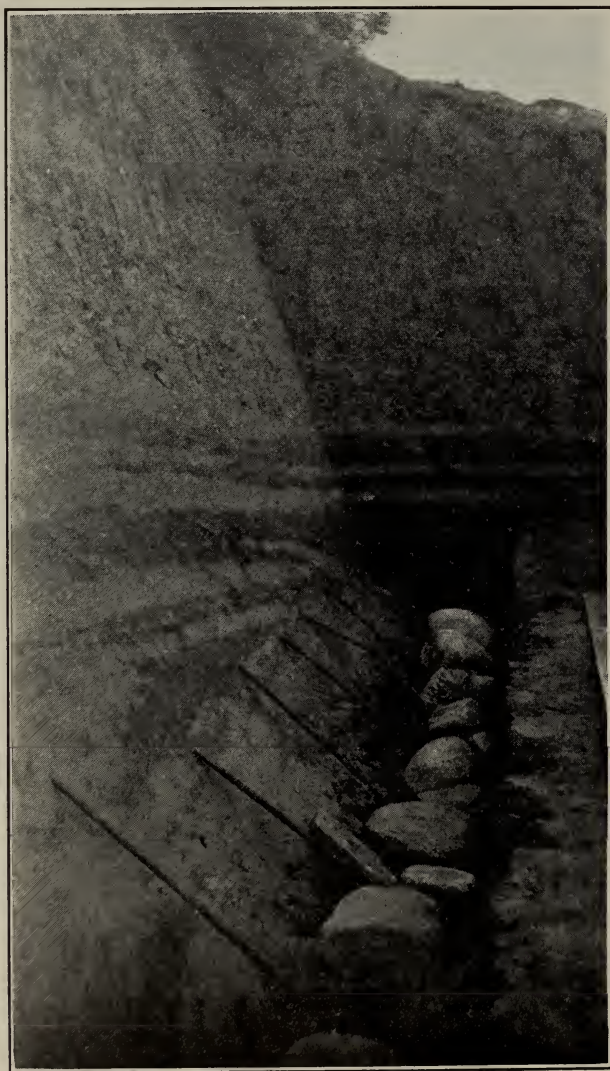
Excavation for concrete headgate showing alternating soil strata; and the foundation for reinforcement.
